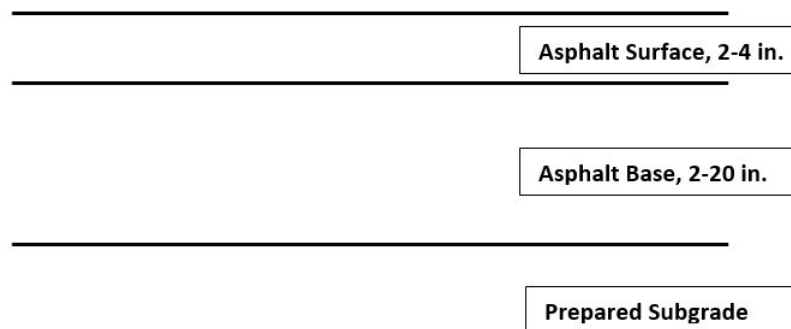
2 Cross-section of Full-depth asphalt pavement (Huang, 2004)
